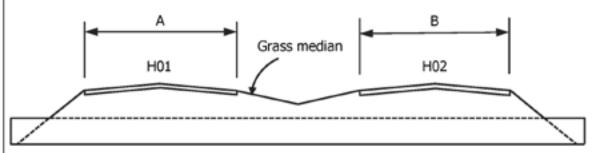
Cross-section view of two highway features carried on the pipe culvert under fill with a grass median.
